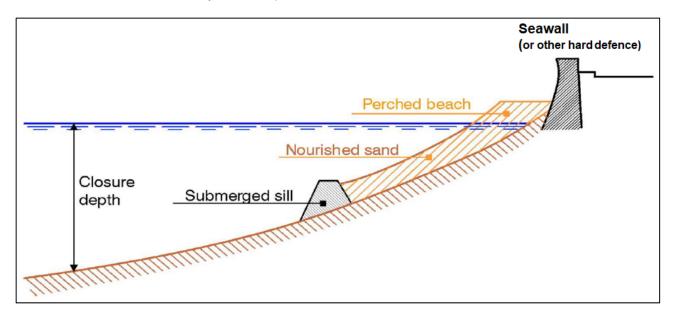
A typical section of a perched beach consisting of beach fill supported by a submerged sill (DHI, 2017).
